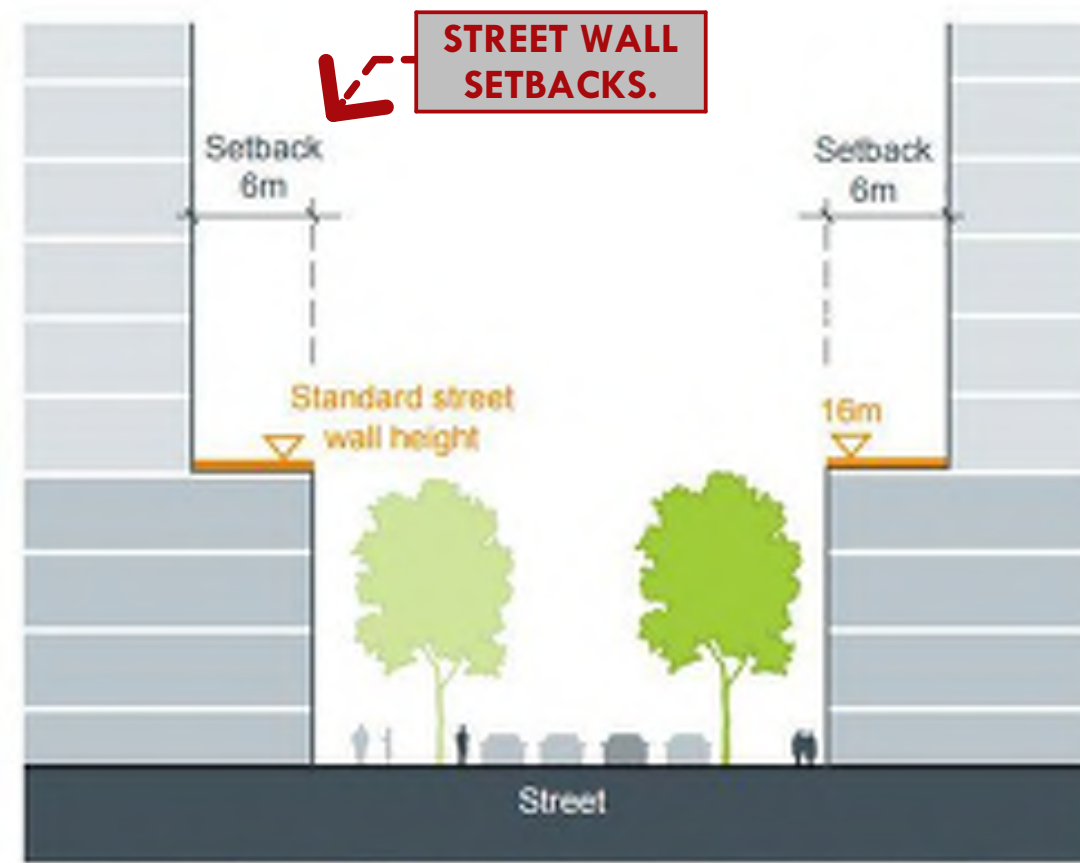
Section showing the typical 16m street wall height and typical 6m upper level setback
